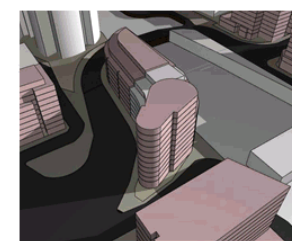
AREA B - BUILT FORM TESTING - EXAMPLE
